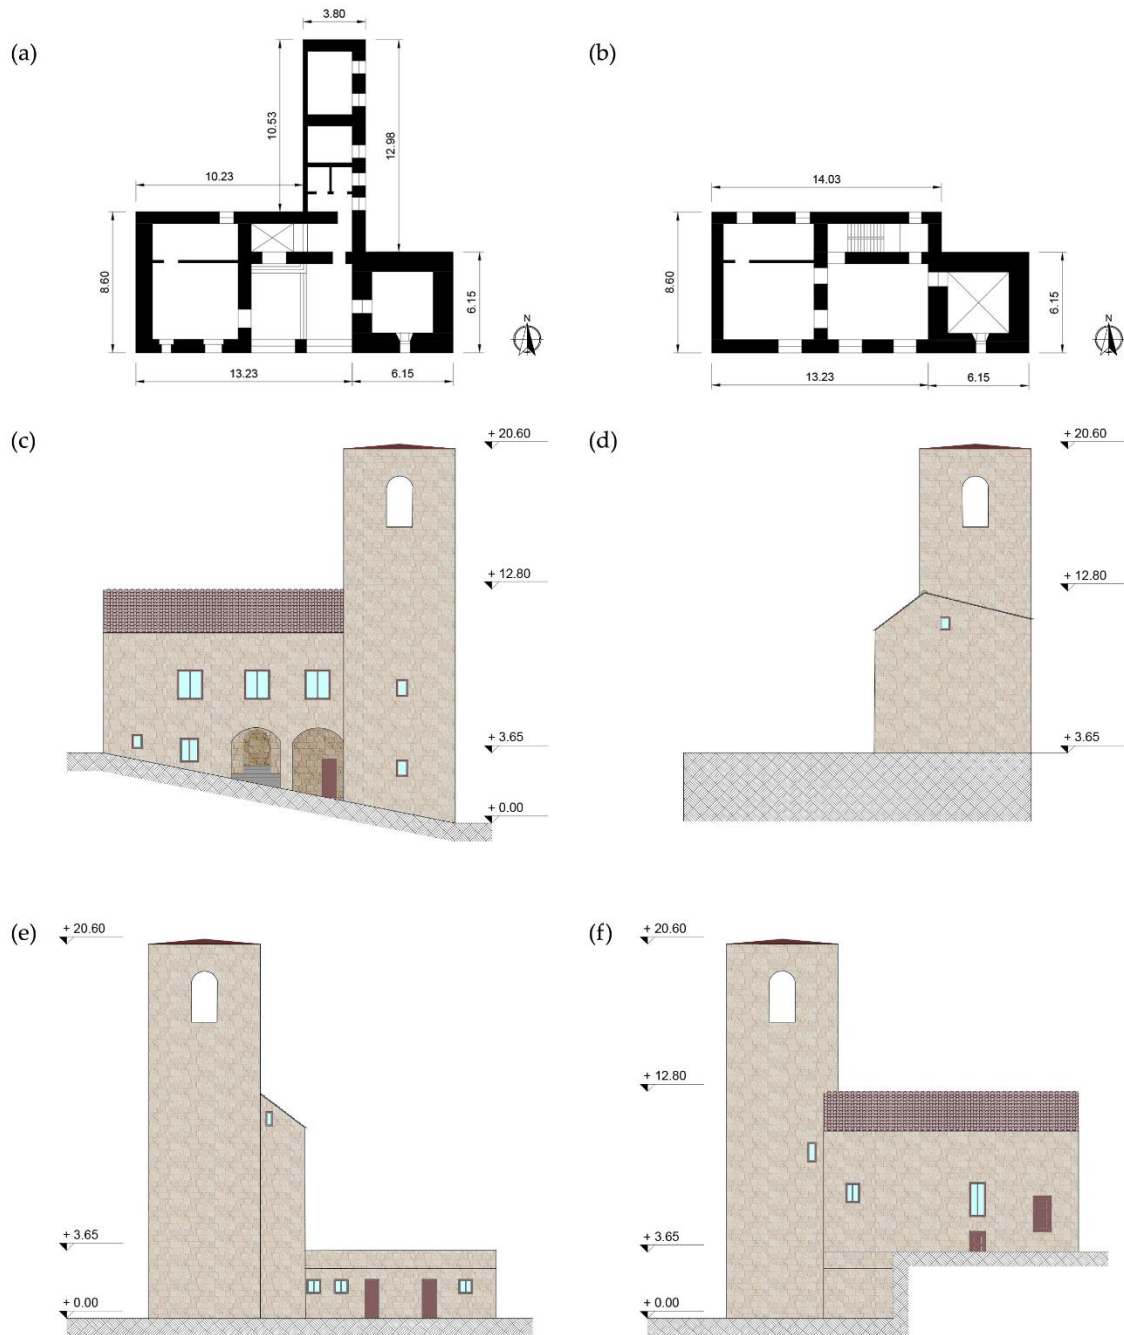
Ground floor (a), First floor (b), North façade (c), West façade (d), East façade (e) and South façade (f). (All dimensions are in meters).
